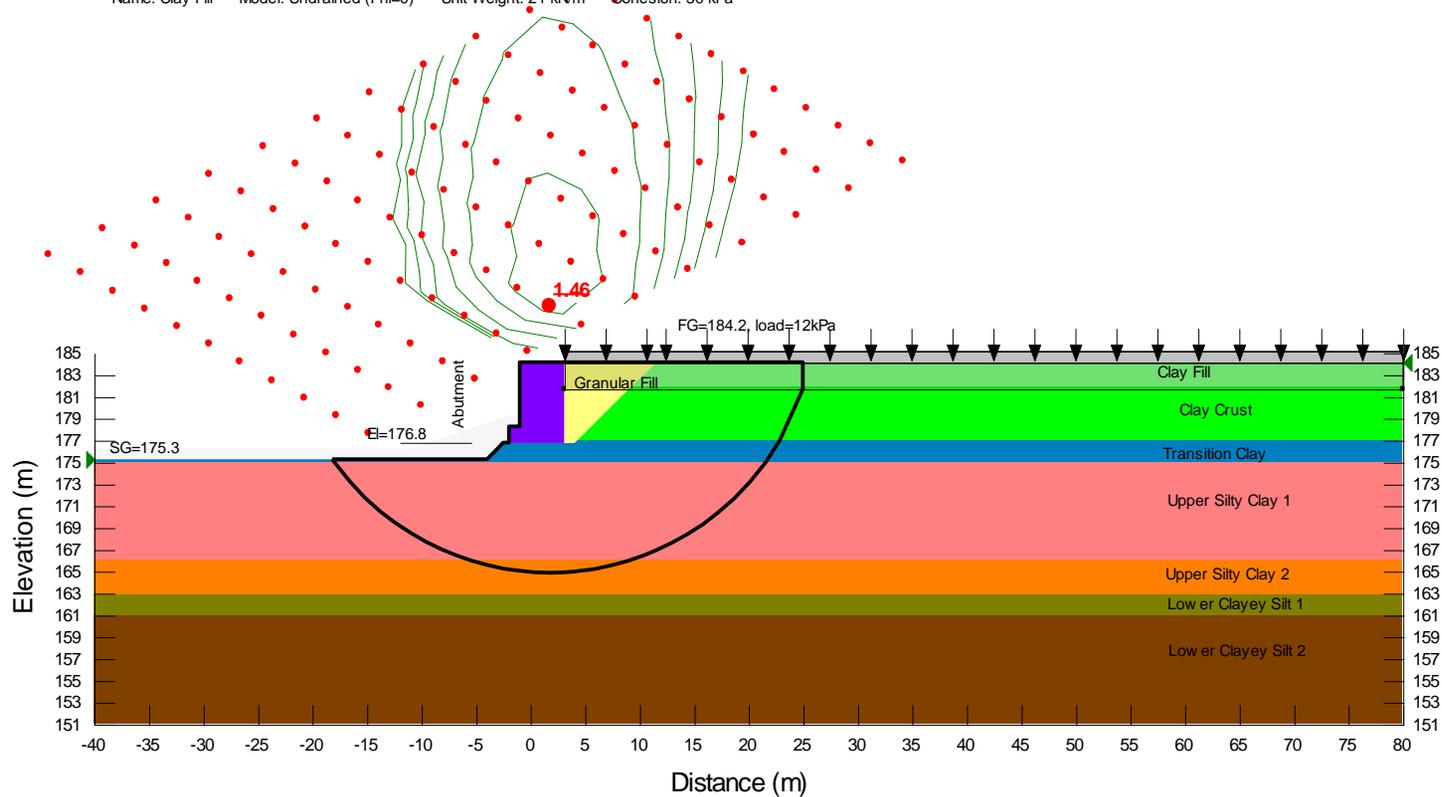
Slope Stability Result – West Abutment – Short-term Loading (Undrained properties)
